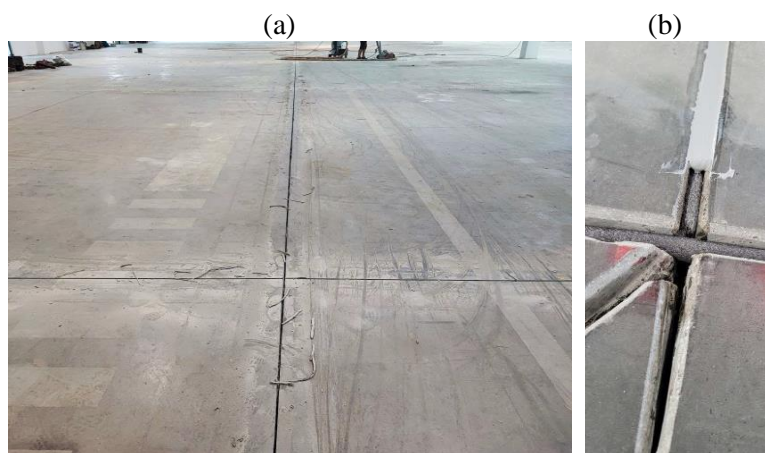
Concrete industrial floor (Example 4) during repair: a) removal of degraded shrinkage joint fill, b) placement of new shrinkage joint fill [38]
